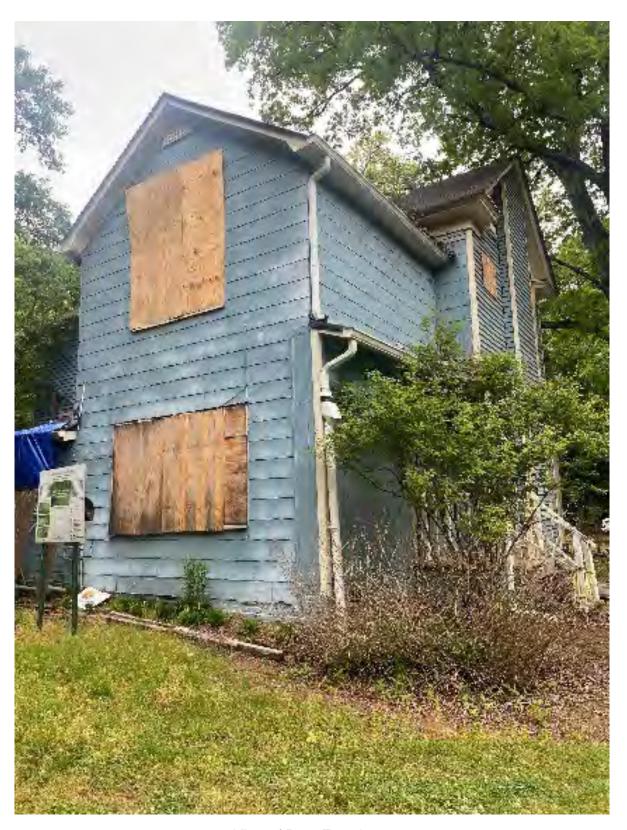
# EXHIBIT A ELEVATION VIEWS OF THE HOUSE
